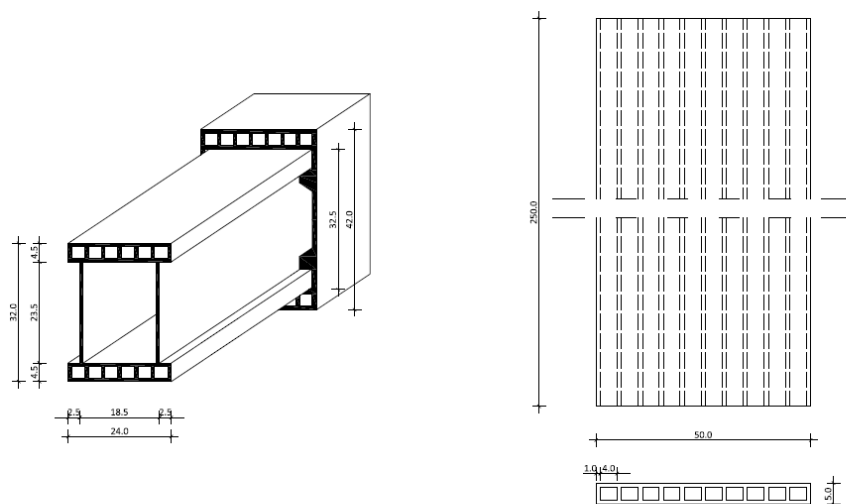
Typical section for a telescopic beam and deck for lightweight bridge
